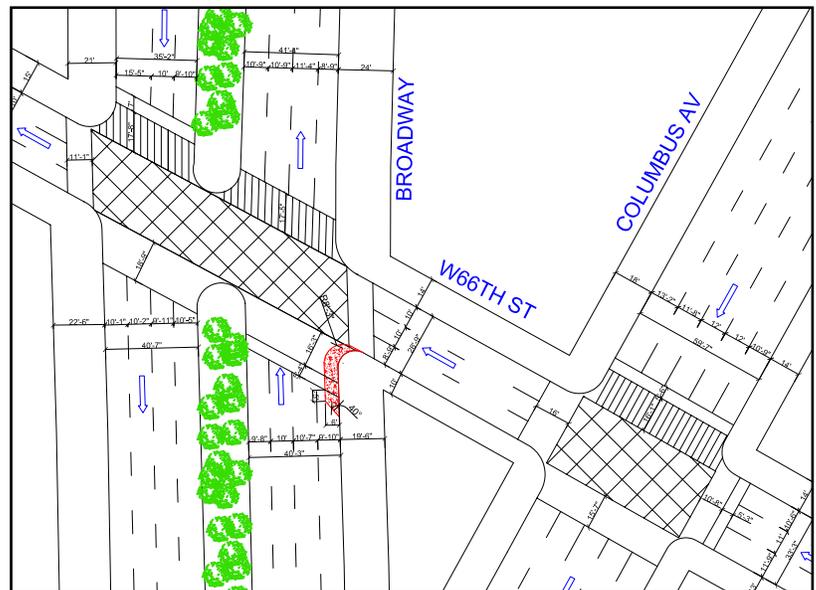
Proposed Recommendation - W 66th Street & Broadway
